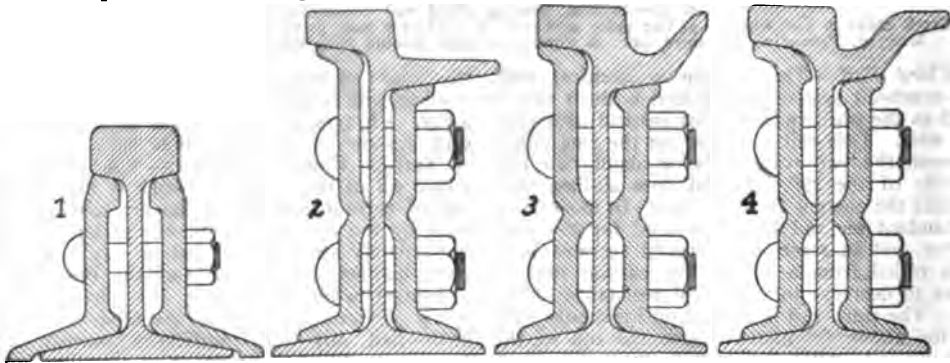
Typical rail sections for street railways. 1. Tee rail; 2. Step or girder rail; 3. Three quarter rail; 4. Full grooved or Trilby rail.
